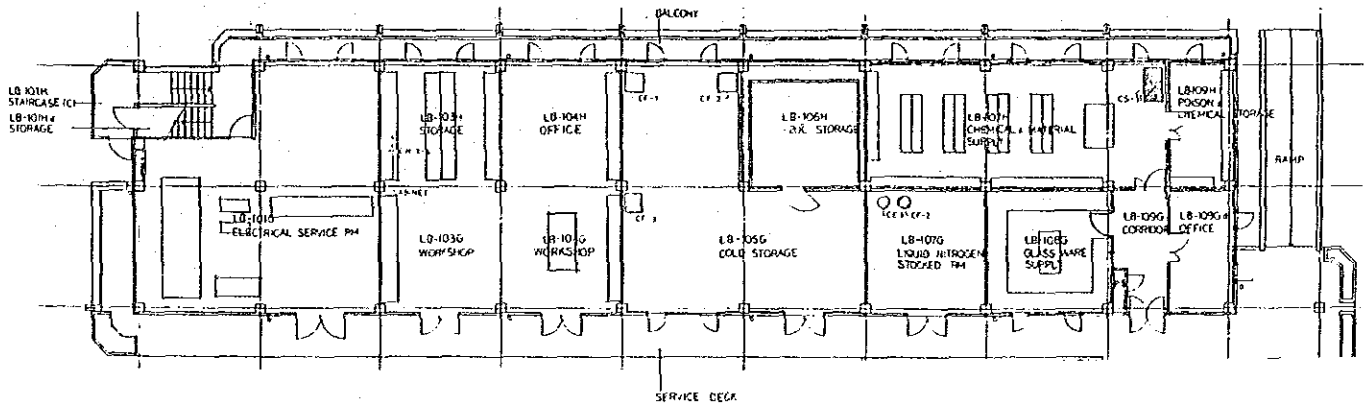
PLANNING OF FIRST FLOOR, WING B
